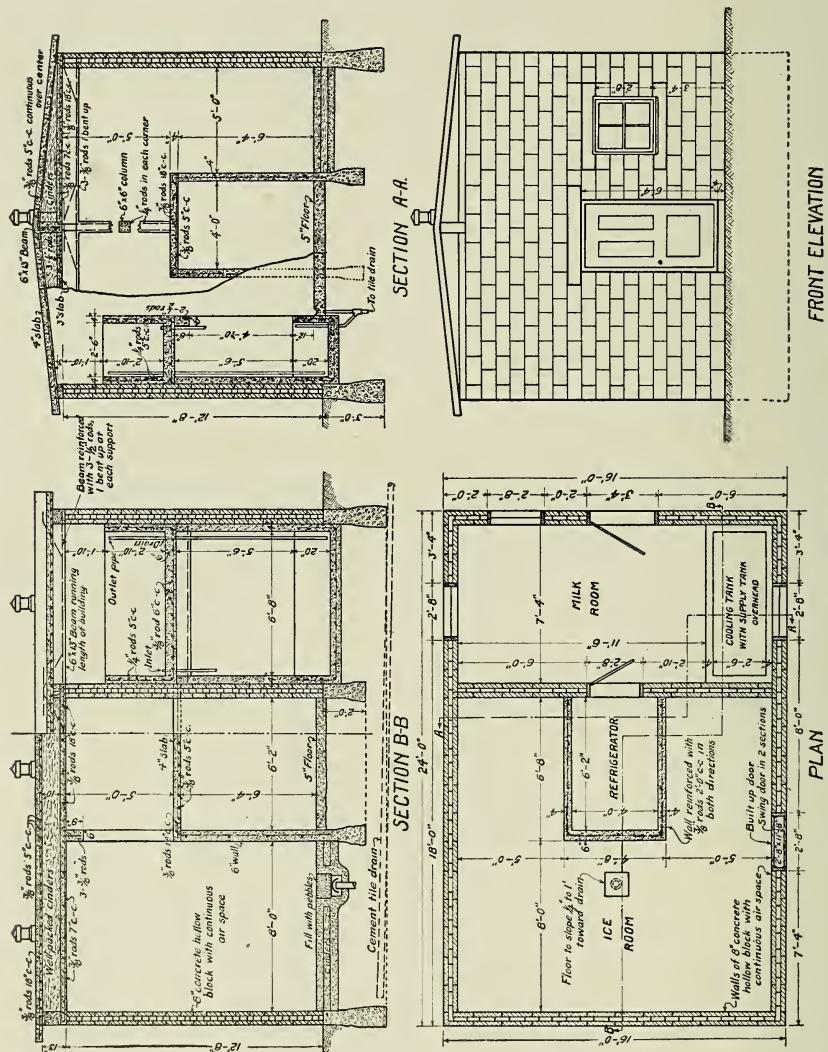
Concrete Block Dairy House with Ice Storage and Cold Room.
